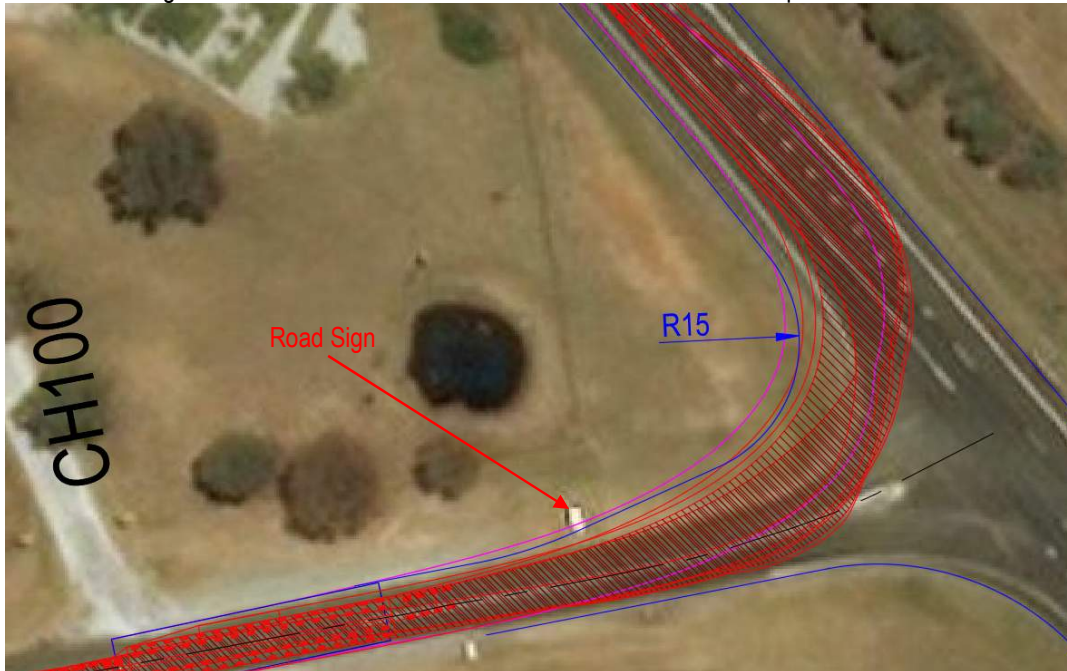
Castlereagh Hwy & Hill End Road intersection.
